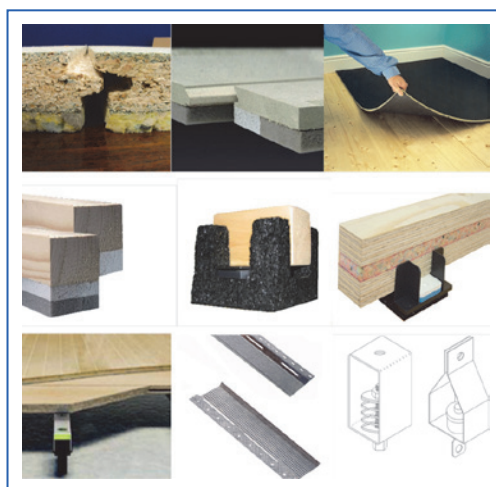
Examples of specialist acoustic construction products for improved sound insulation. (Left to right: shallow floor deck using recycled foam, dual foam shallow decks, bonded soft floor coverings, resilient flooring battens, rubber crumb based floor cradles, deep floor cradle systems, raised access floors, resilient bars and acoustic ceiling hangers).
